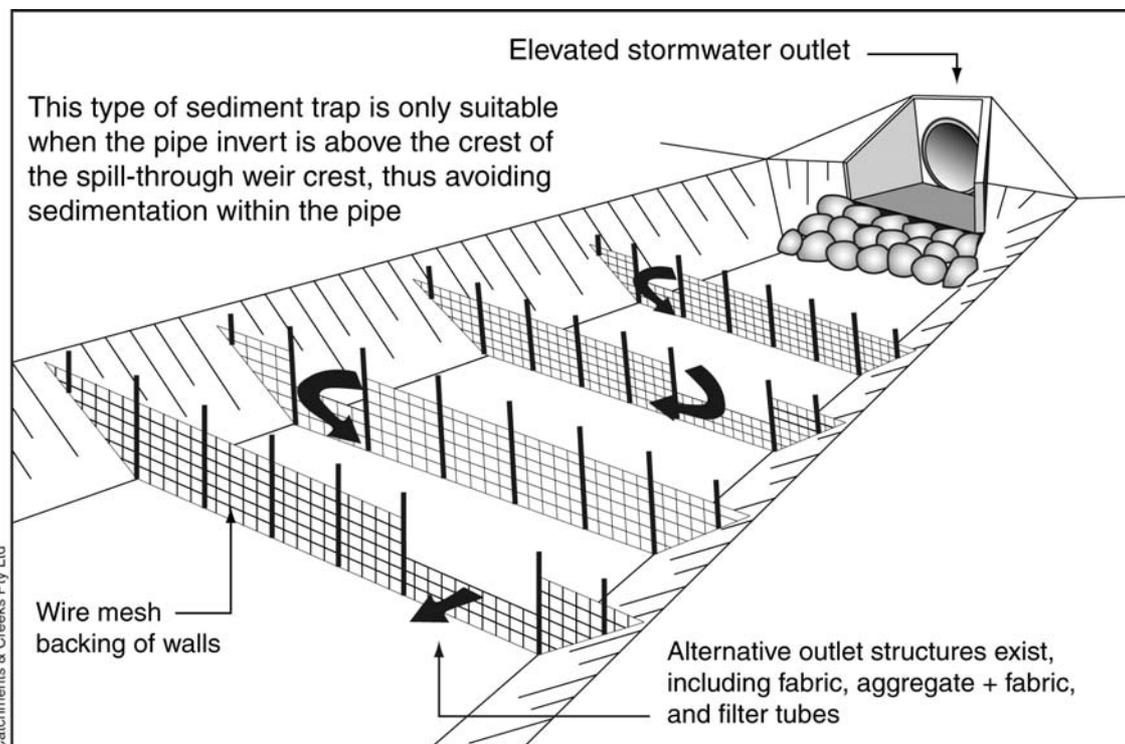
Partially enclosed coarse sediment trap located at a stormwater outlet
